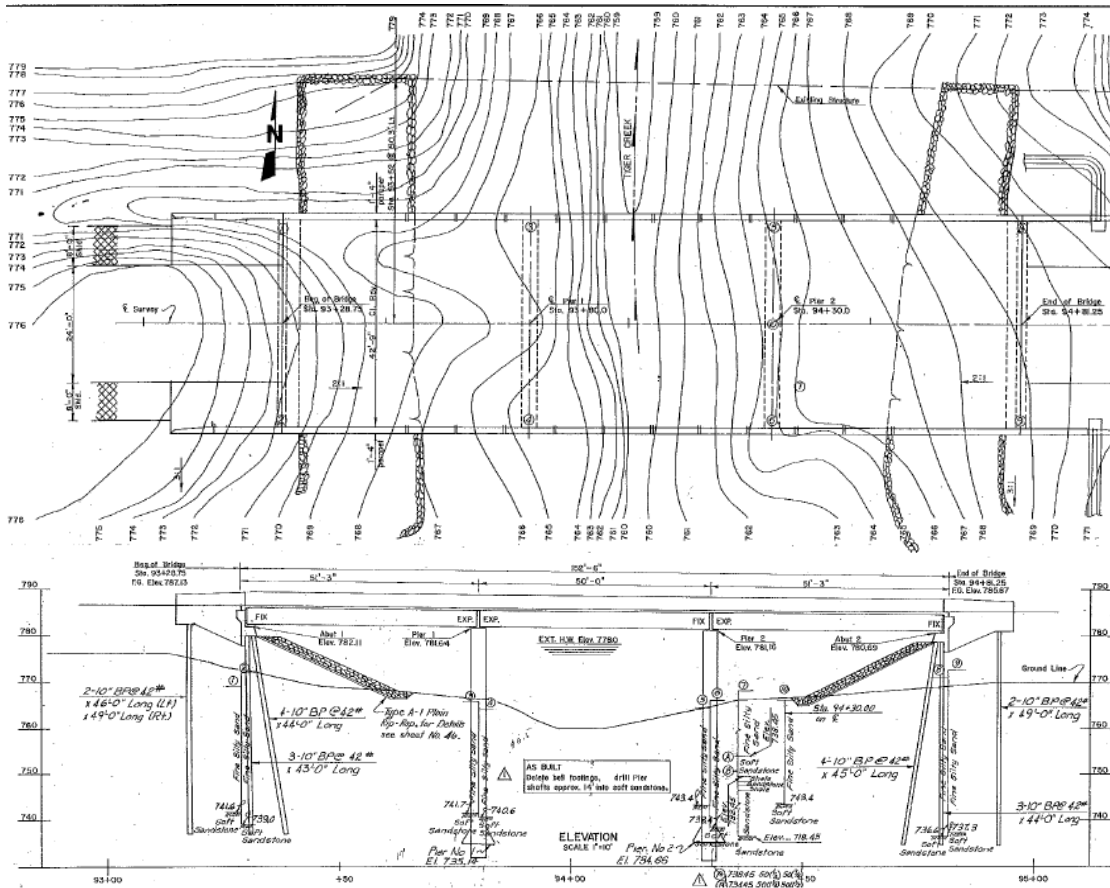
General plan and elevation of the SH-99 bridge over Tiger Creek. Taken from FAS Project No. R.S. 1910(103) plans.
